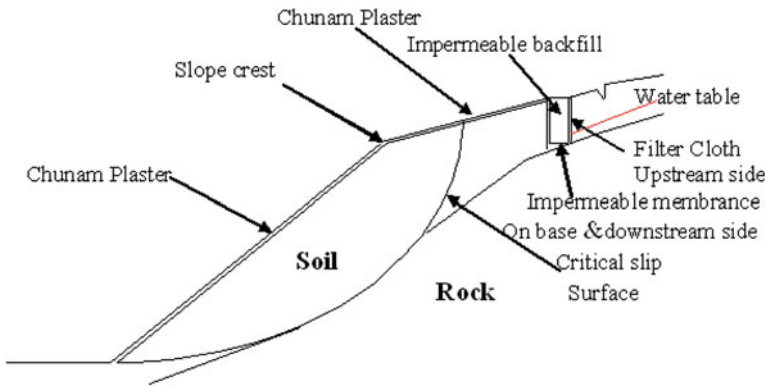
Mechanism of Chunam Plaster to protect a soil slope
